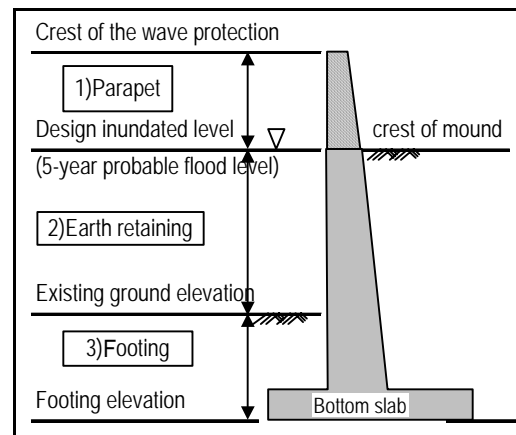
Composition of RCC inverse T-type retaining wall
